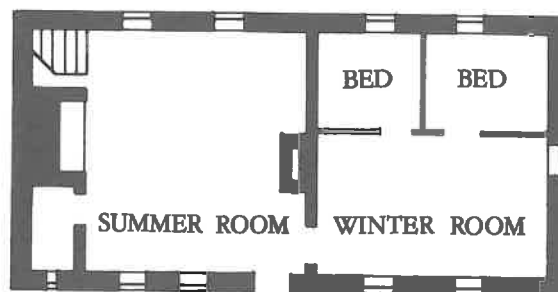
Plan of a typical French stone cottage. (From: *Cottages of Quebec*, p. 9.)
